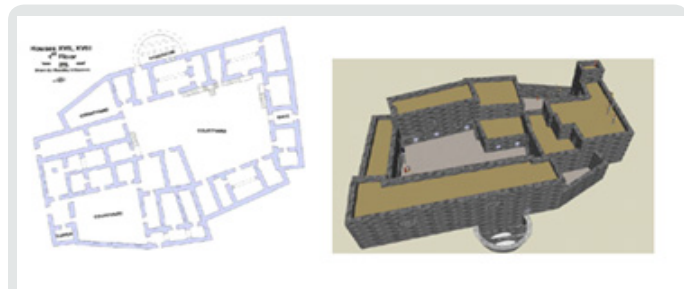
a) 1st Floor plan of house XVII, b) Schematic 3-D rendering of House XVII-XVIII Complex
